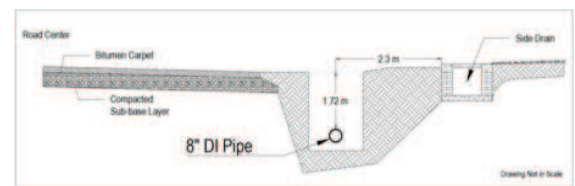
Section of TP-9 (Eastside of Mahendra Chowk Road)
